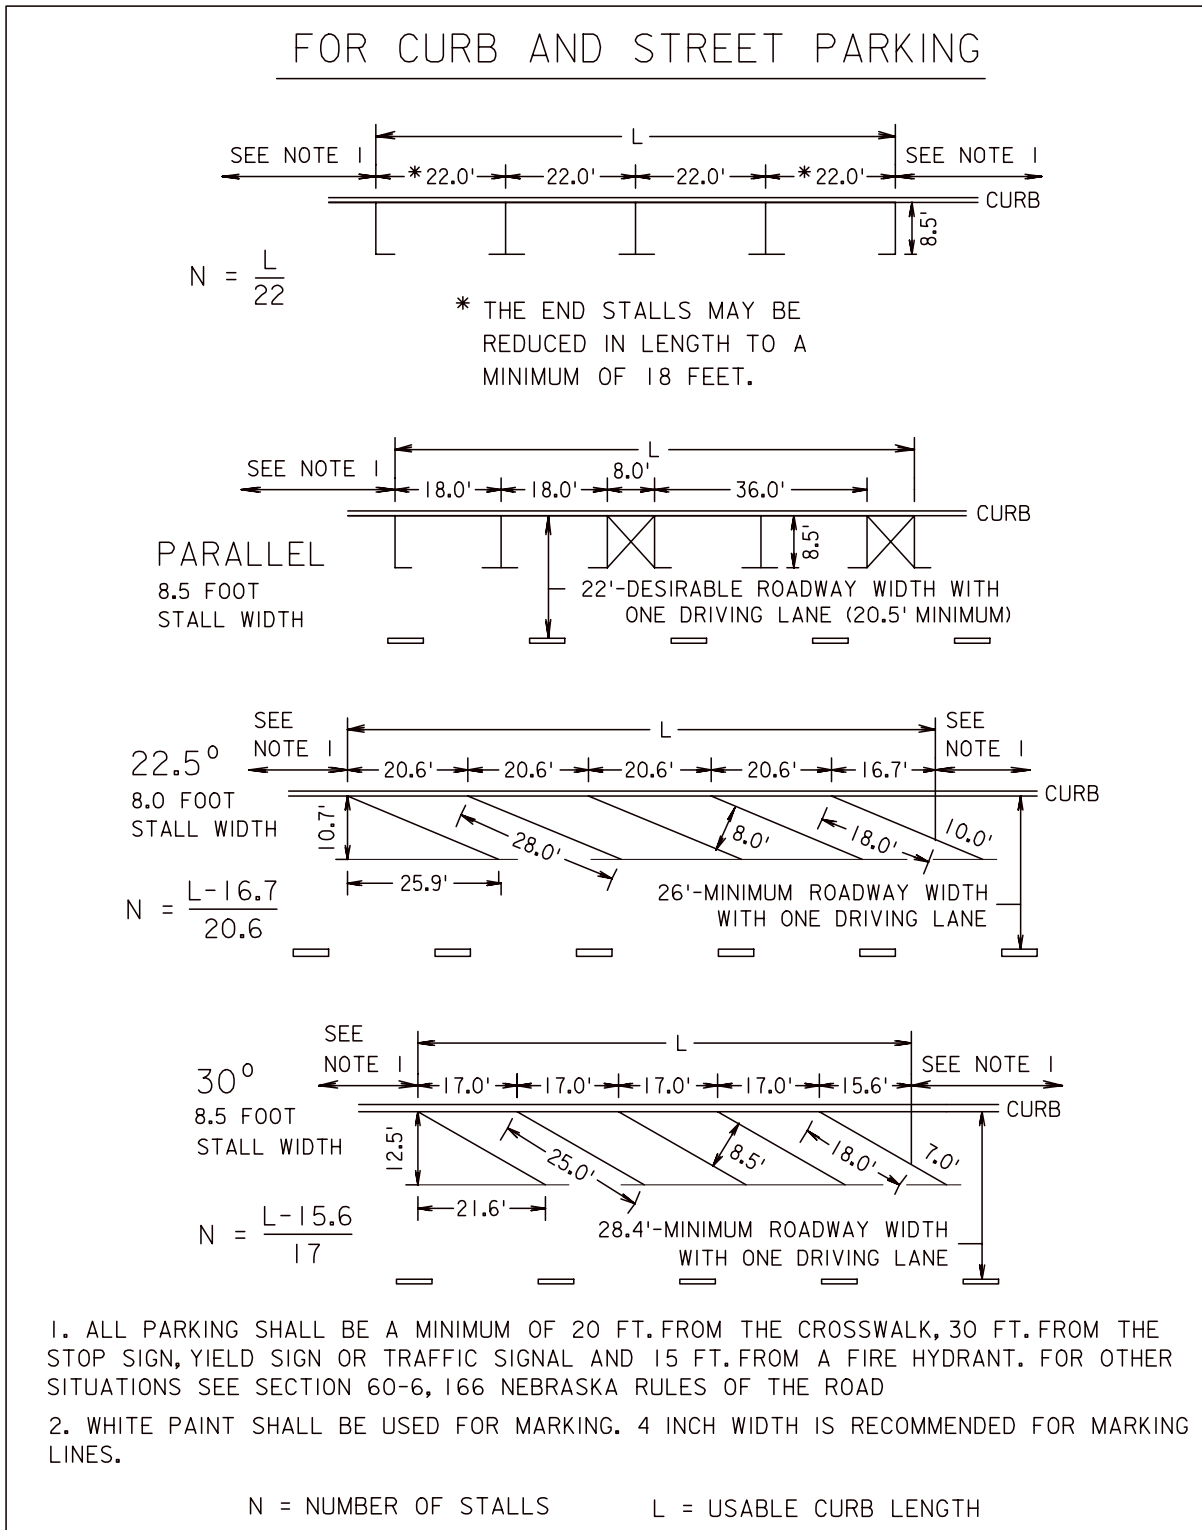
Parking Stall Dimensions for Curb and Street Parking (English)
